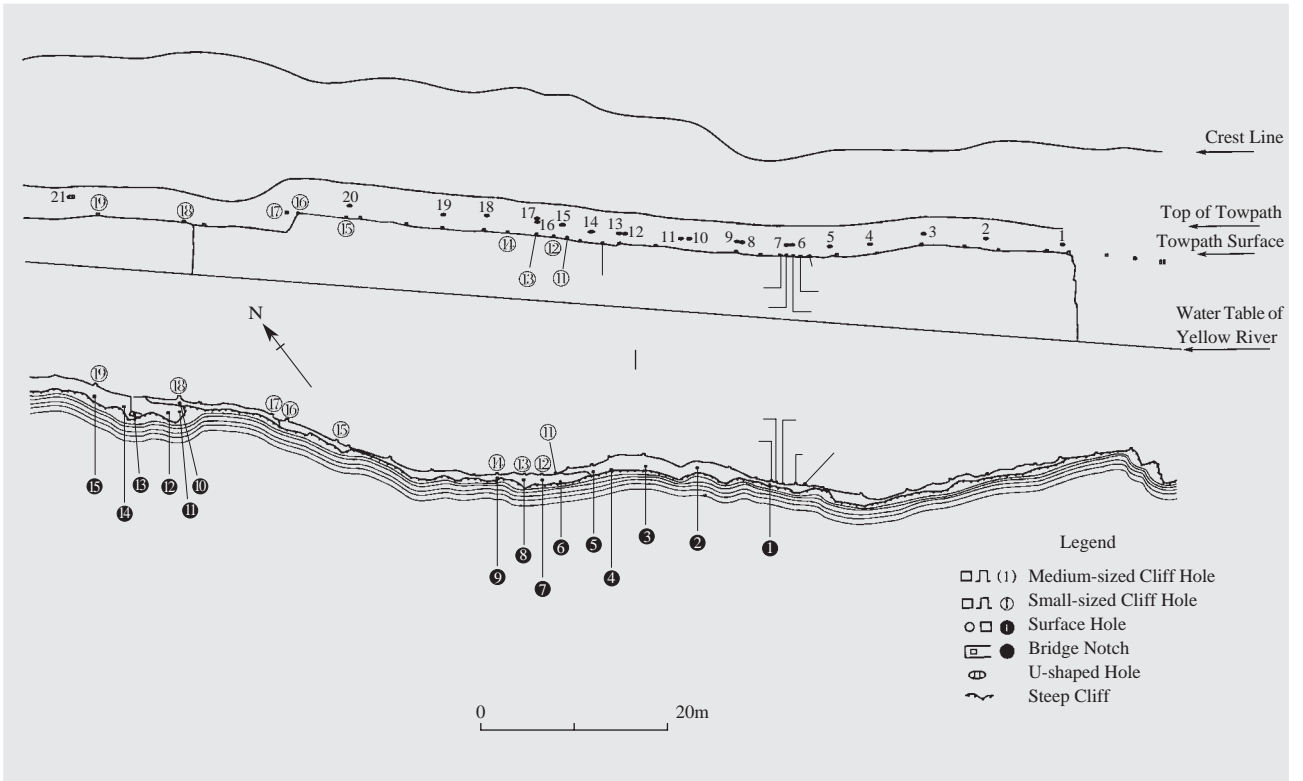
The Elevation and Plan of Towpath Remains of Section Five (1)
